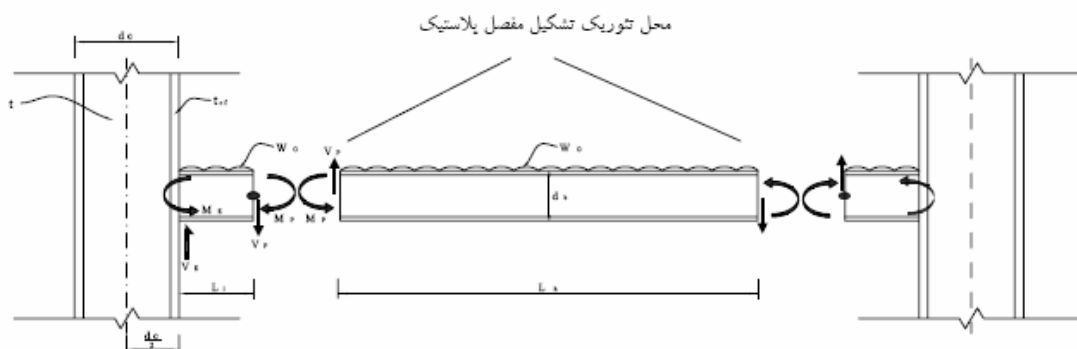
Example calculation of shear at center of RBS cuts.
